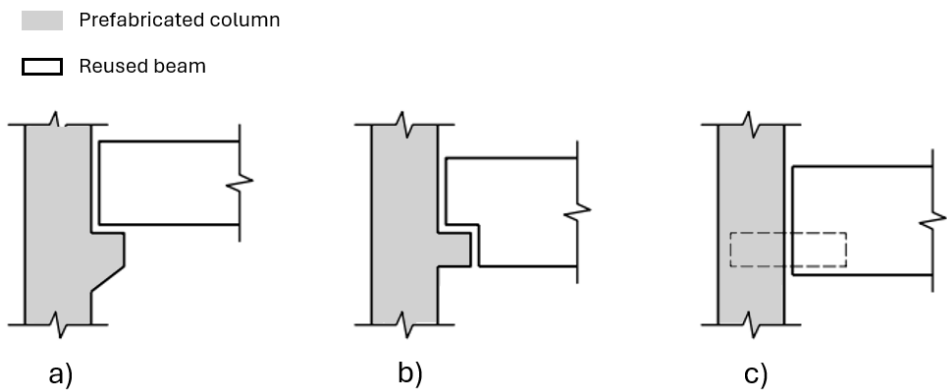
Schematic representation of the prefabricated column-beam solutions, a) corbel connection, b) toothed connection, c) steel anchoring connection
